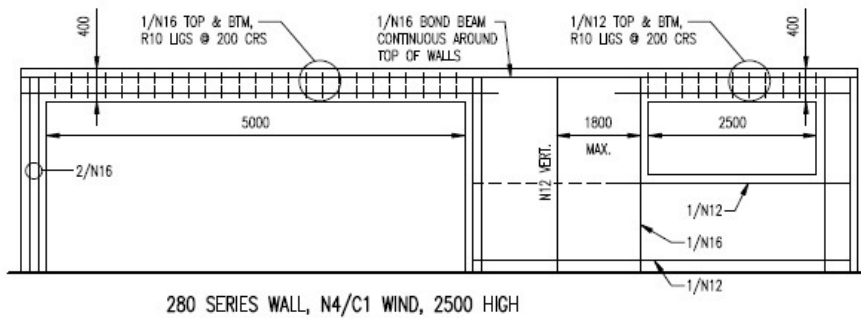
2500 High Wall, N4/C1 Wind Rating, 280 Series ECO-Block (Max. roof load width: 5.4m)
